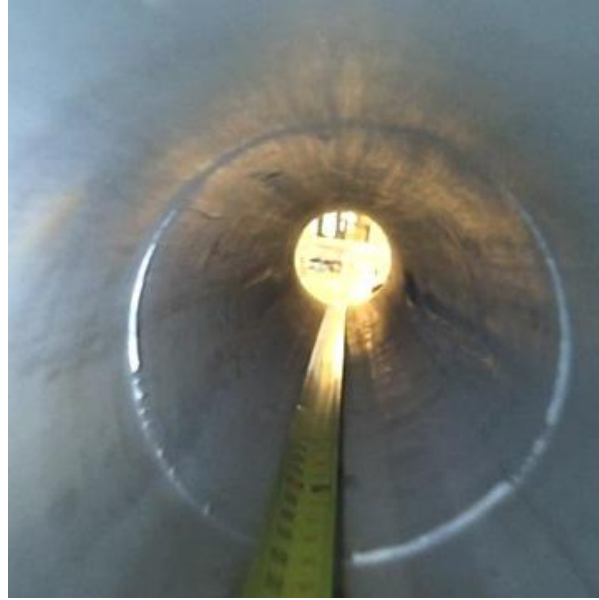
Image of Specimen 10 Liner after First Rotation Testing Showing a Crack at the Center
